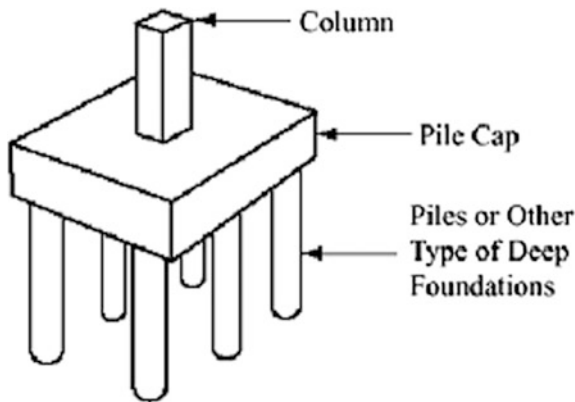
A pile cap made of a concrete block cast on the head of a group of piles
